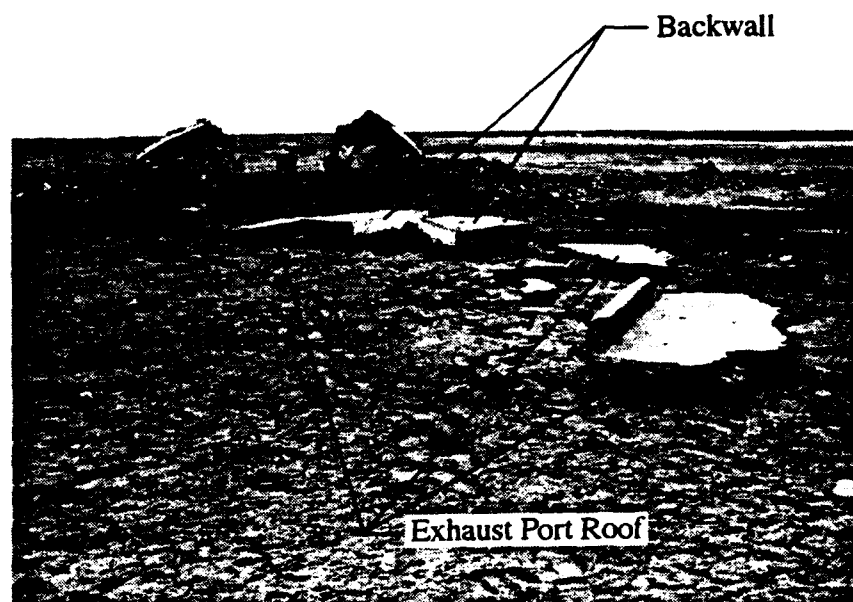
Exhaust port roof and center section of backwall, PAS-4.
